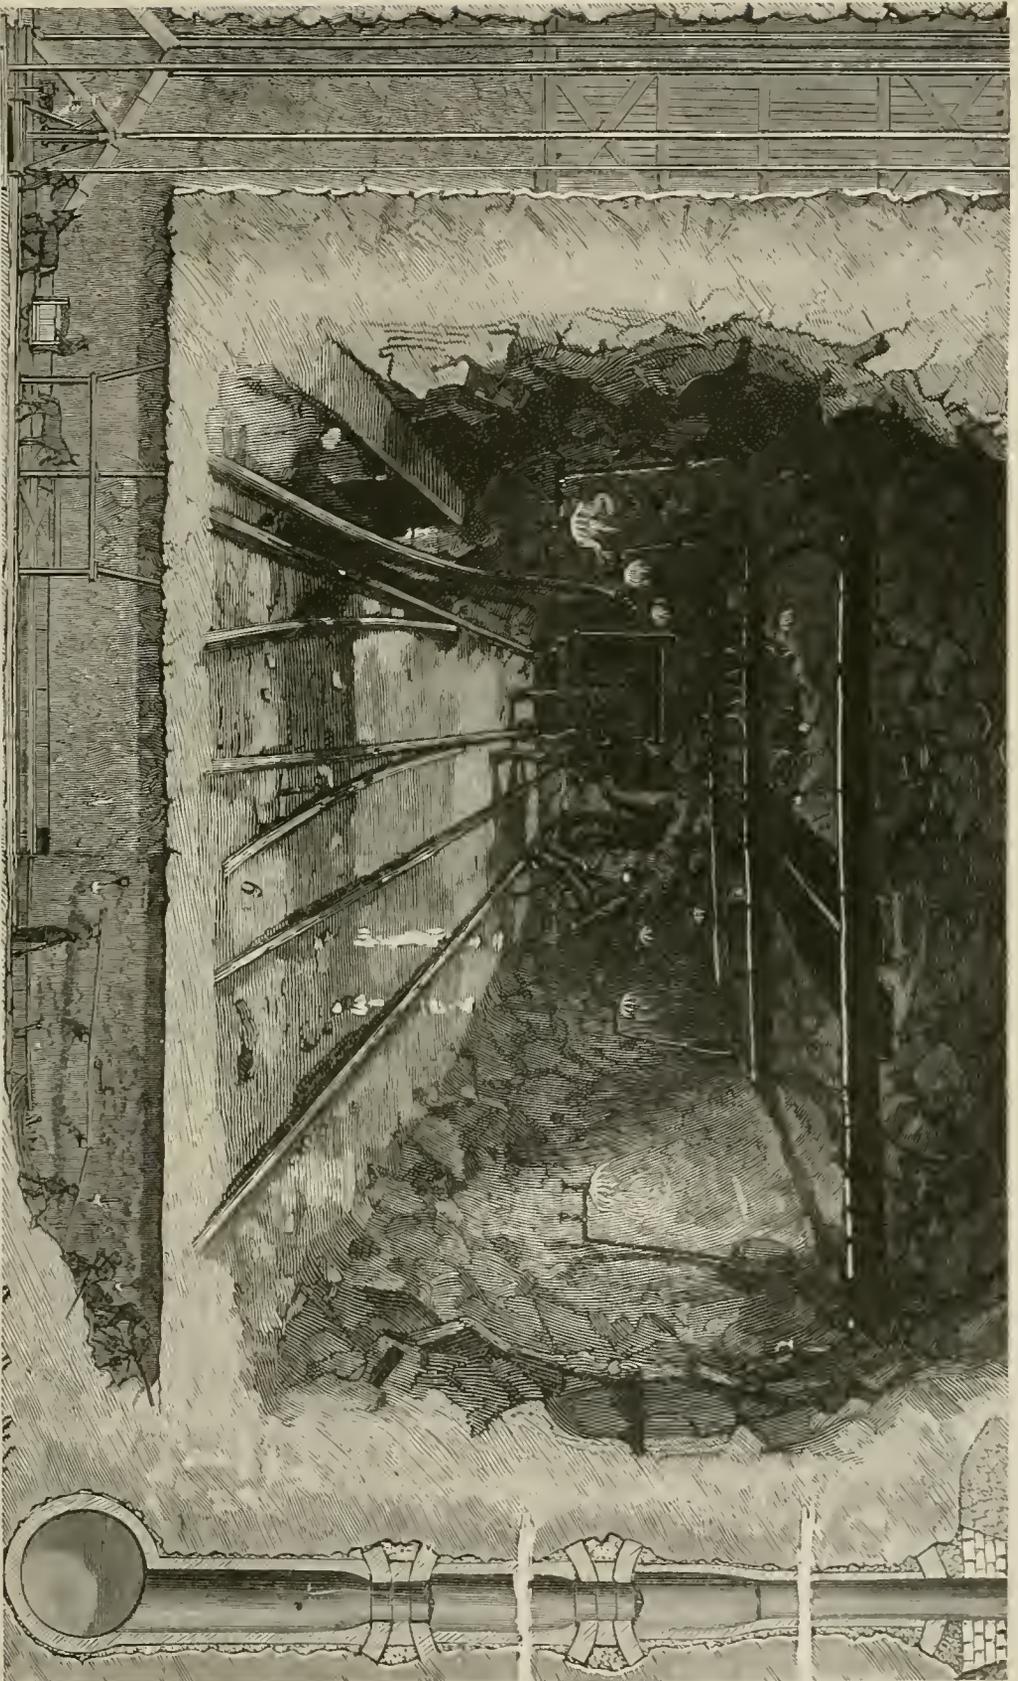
Work at the New Croton Aqueduct Tunnel. North Heading at Shaft No. 11.
